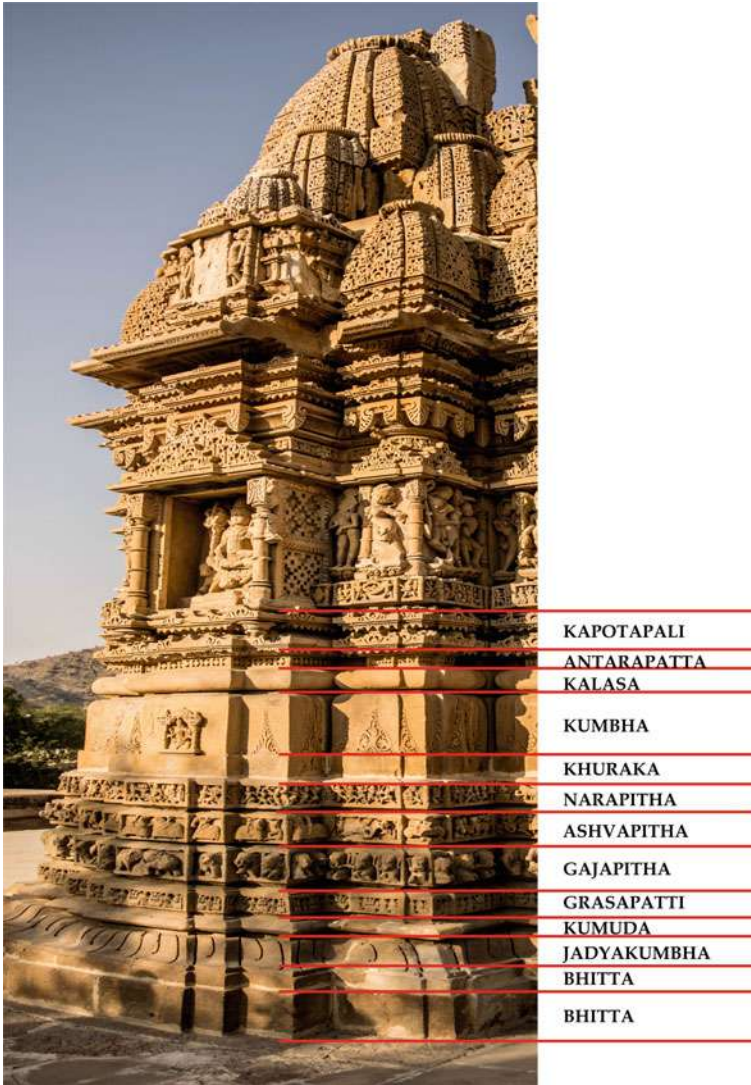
Architectural details of Udhavachhand section of the Shiva Temple (Temple No. 1) (Dhaky, 1998)
